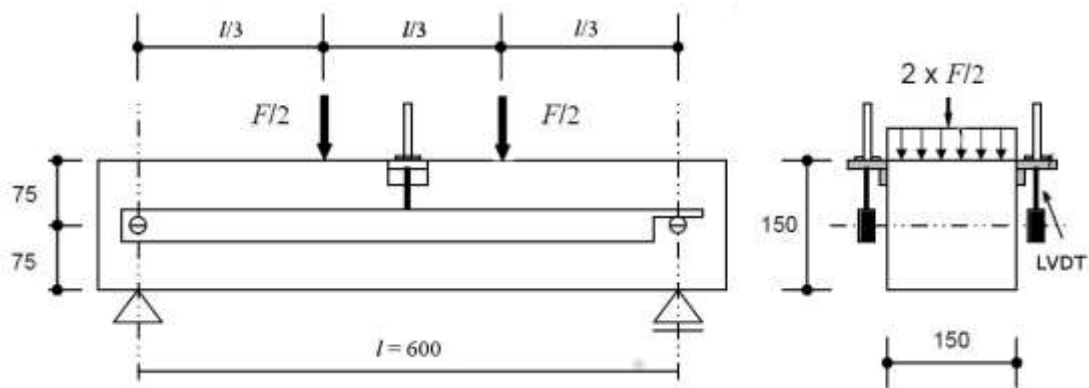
Four point bending test setup recommended by DAfStb [109]
